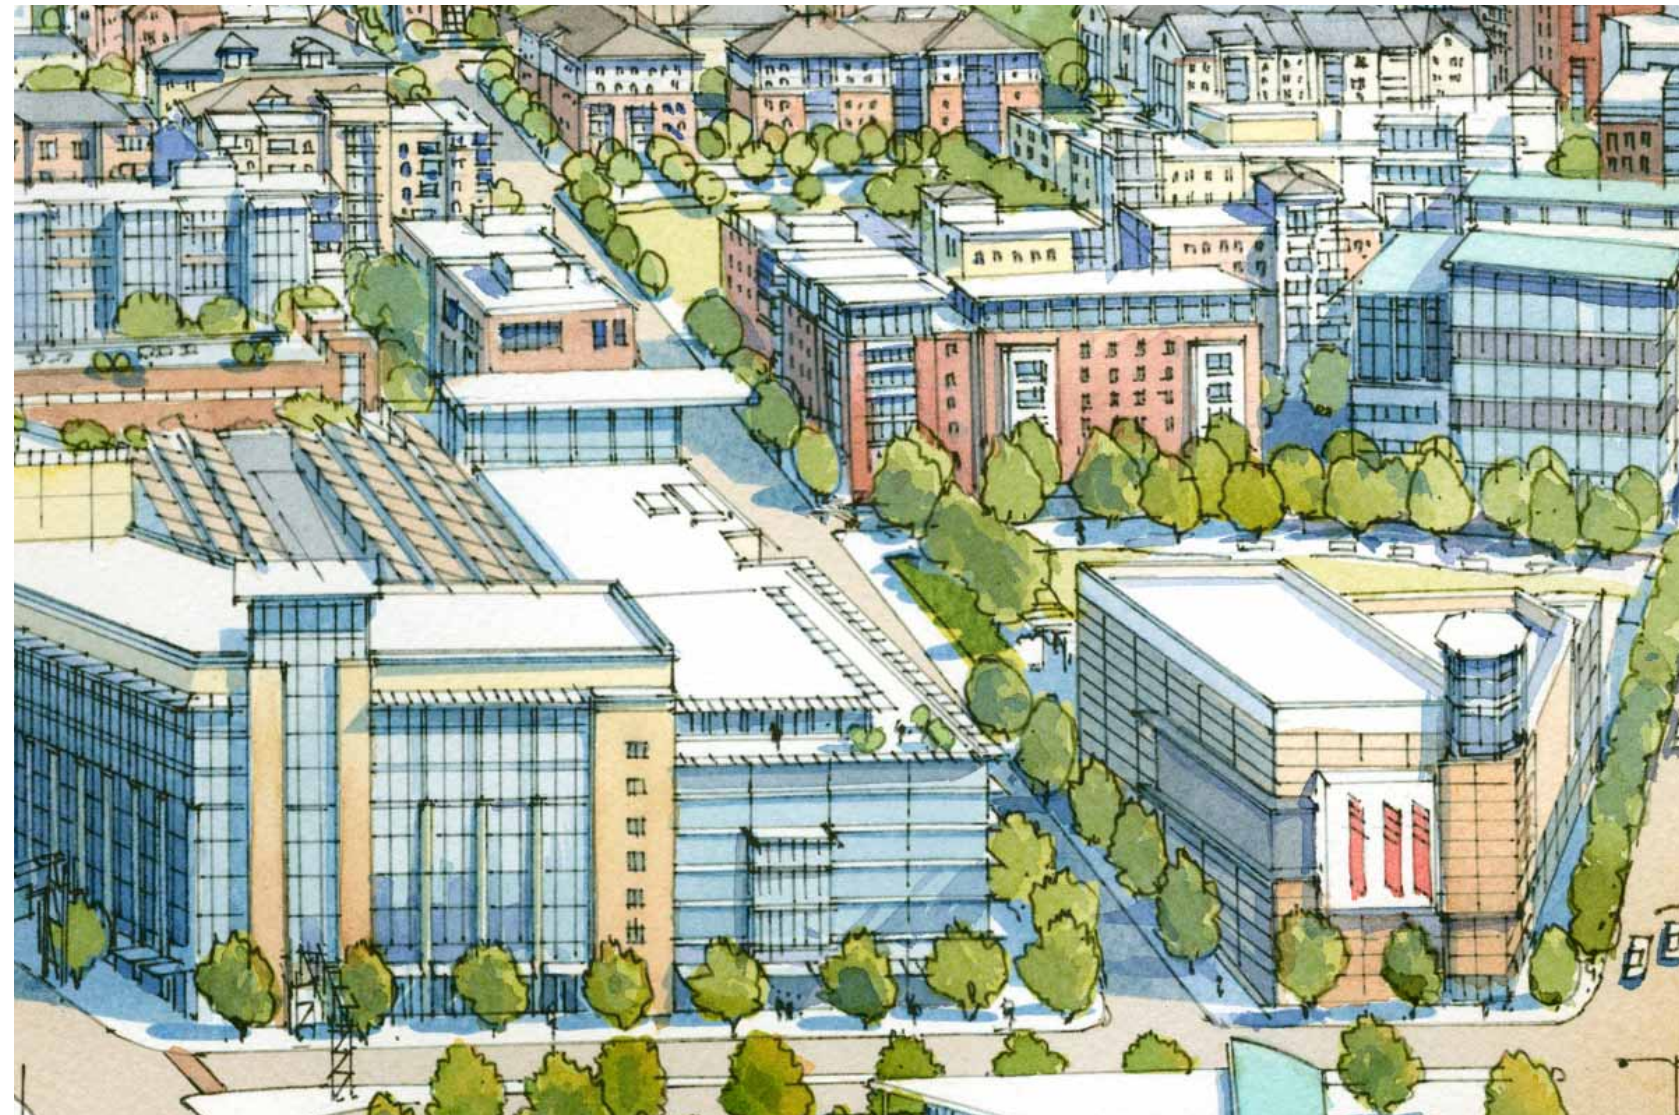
Example of a Tower Building designed for residential condos.
